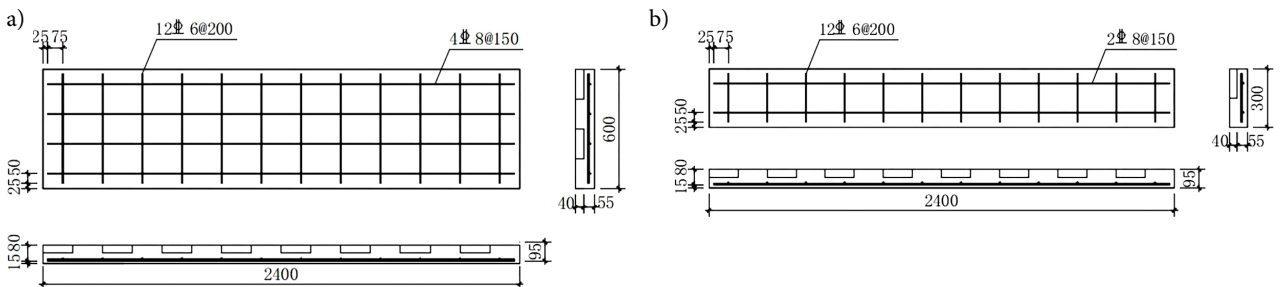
Design of the new fully prefabricated slab: a – ZPB-1; b – ZPB-2
